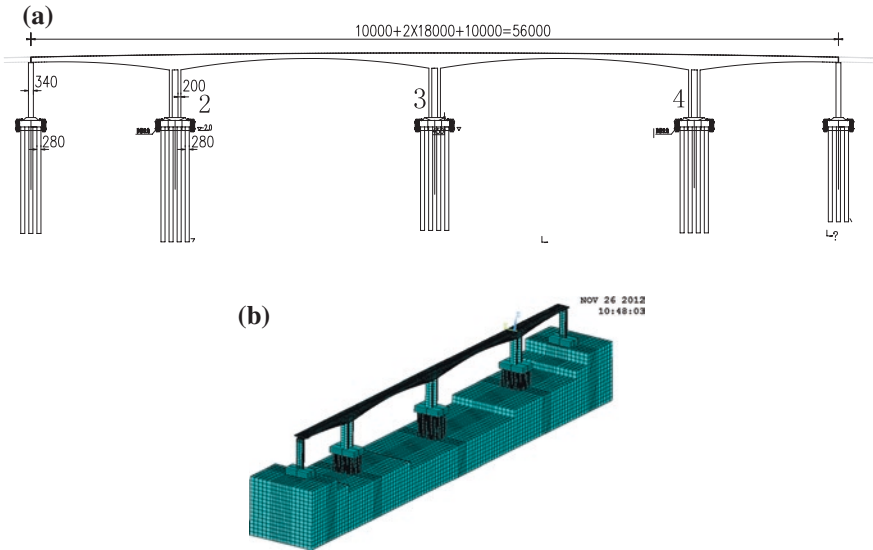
Layout of the long-span bridge and FEA model: a Elevation b Soil-bridge finite element model
